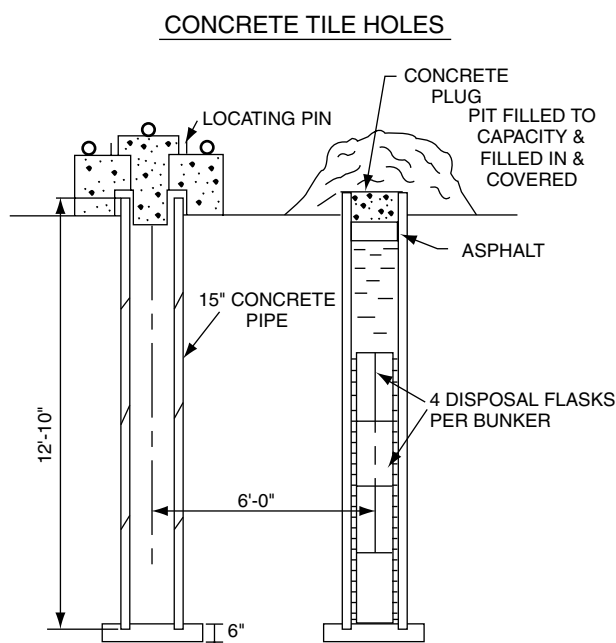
Concrete Holes, constructed from drain pipe painted with bitumen, provide well-shielded receptacles for high-level solid waste.
